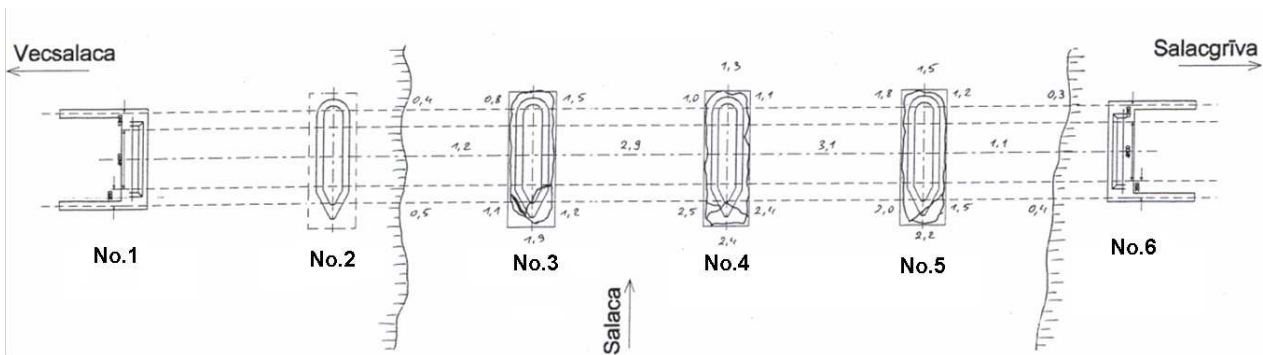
The plan of piers and foundation damage of the bridge over river Salaca
